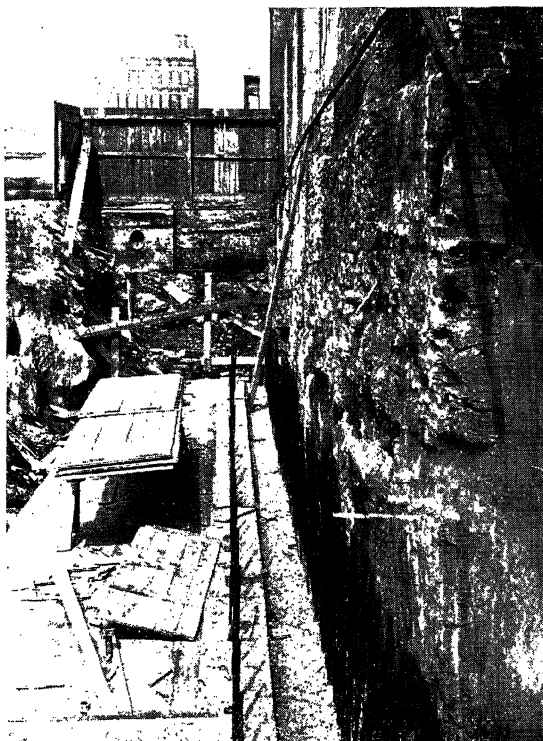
Footing of reversed L-shaped retaining wall, New York approach to Lincoln Tunnel.
